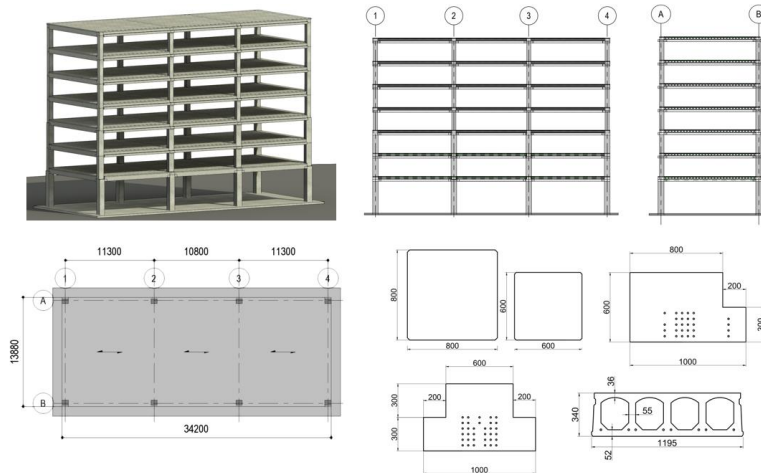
Multi-story building: general view; longitudinal and transversal section; plan; column, beam and slab panel section.
